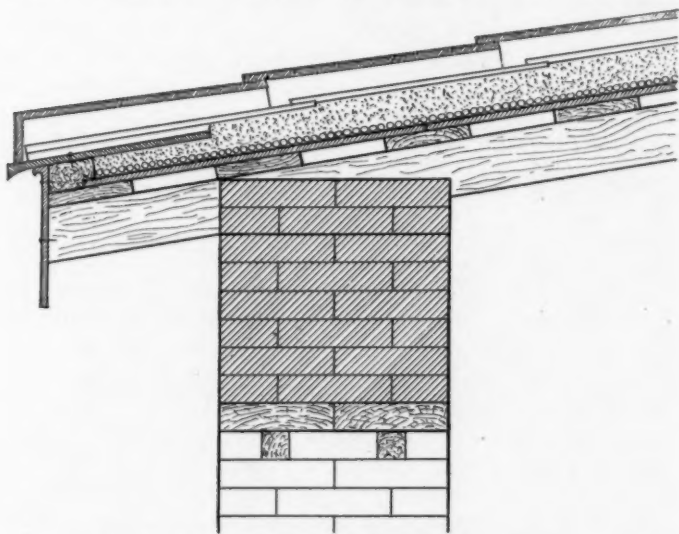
SECTION SHOWING ROOF CONSTRUCTION.
